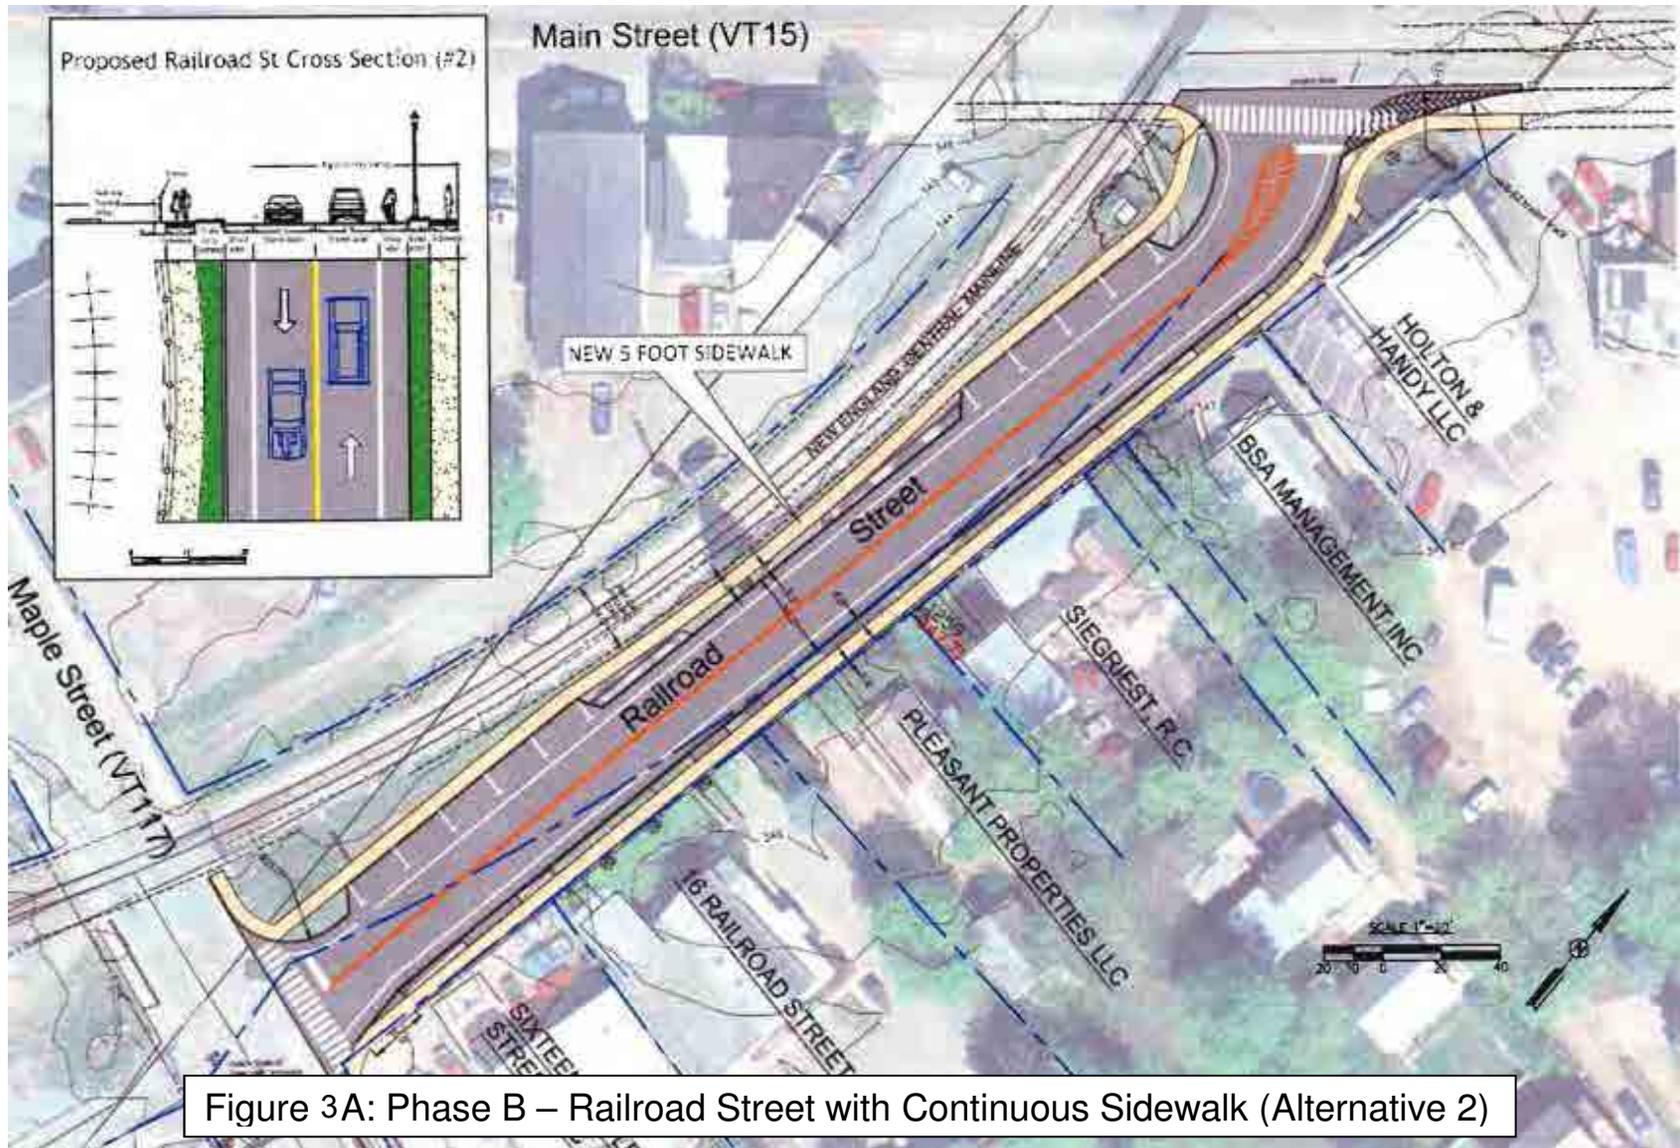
A: Phase B – Railroad Street with Continuous Sidewalk (Alternative 2)
